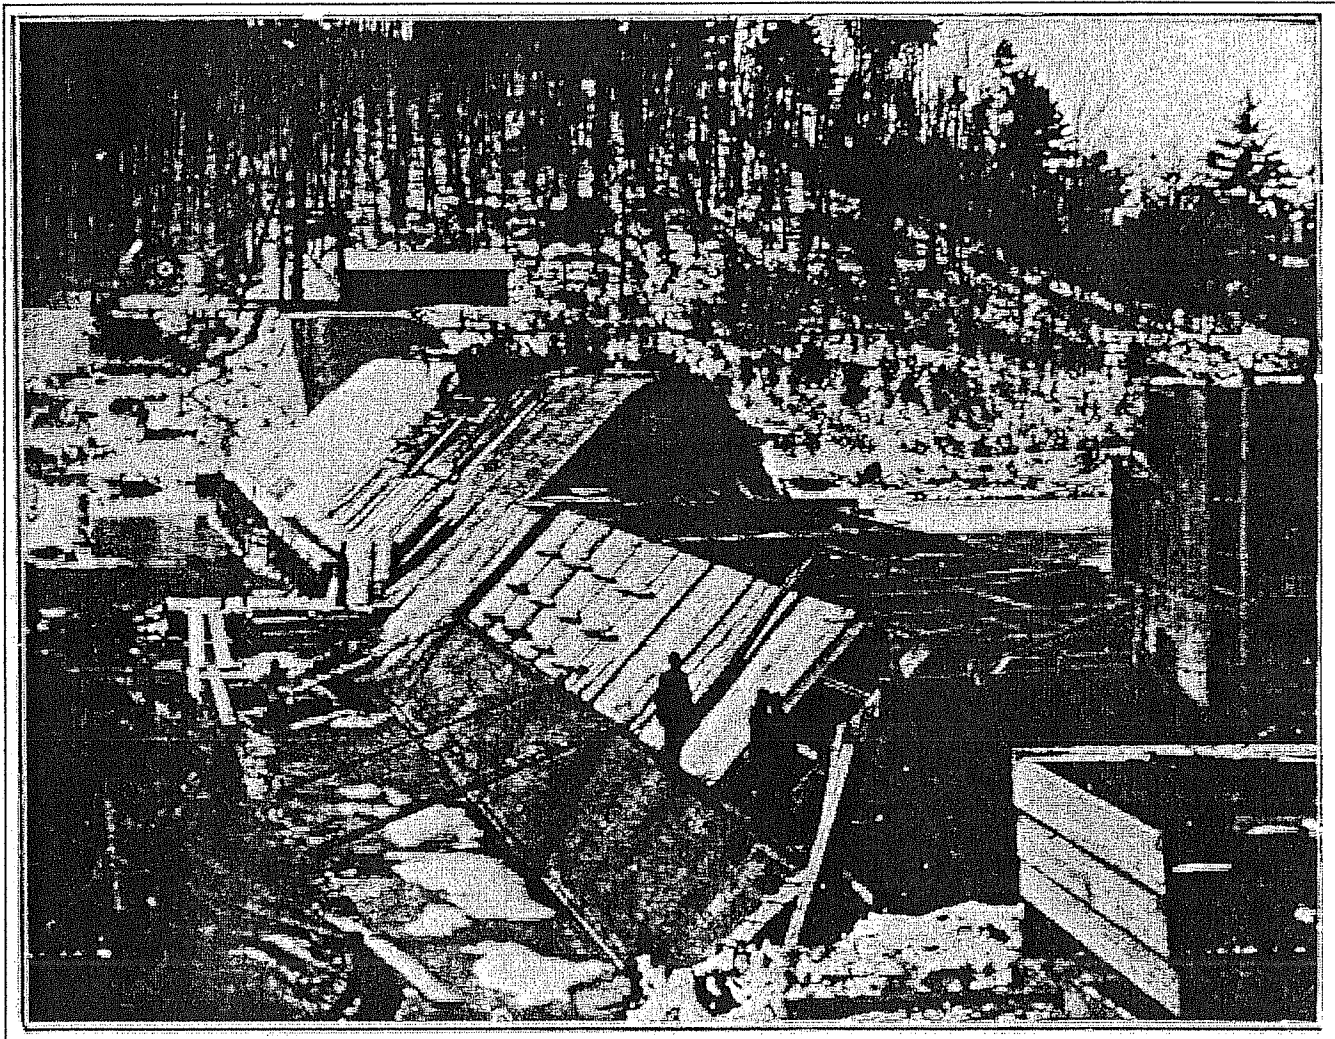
Photograph of a dam under construction in Schuylerville, New York, similar to the Main Street Dam, also built by the Ambursen Hydraulic Construction Company.
